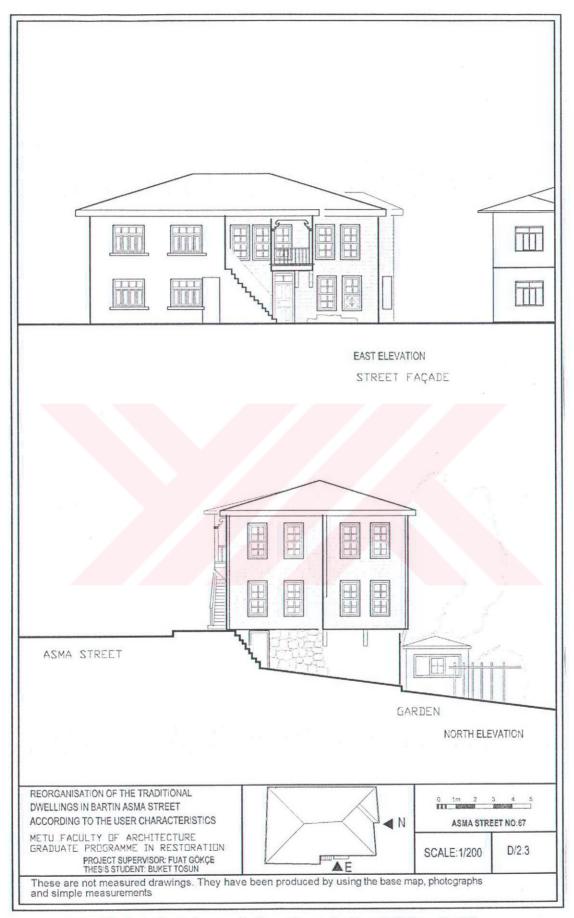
Sketch Drawings of Facades of the Building No:67
